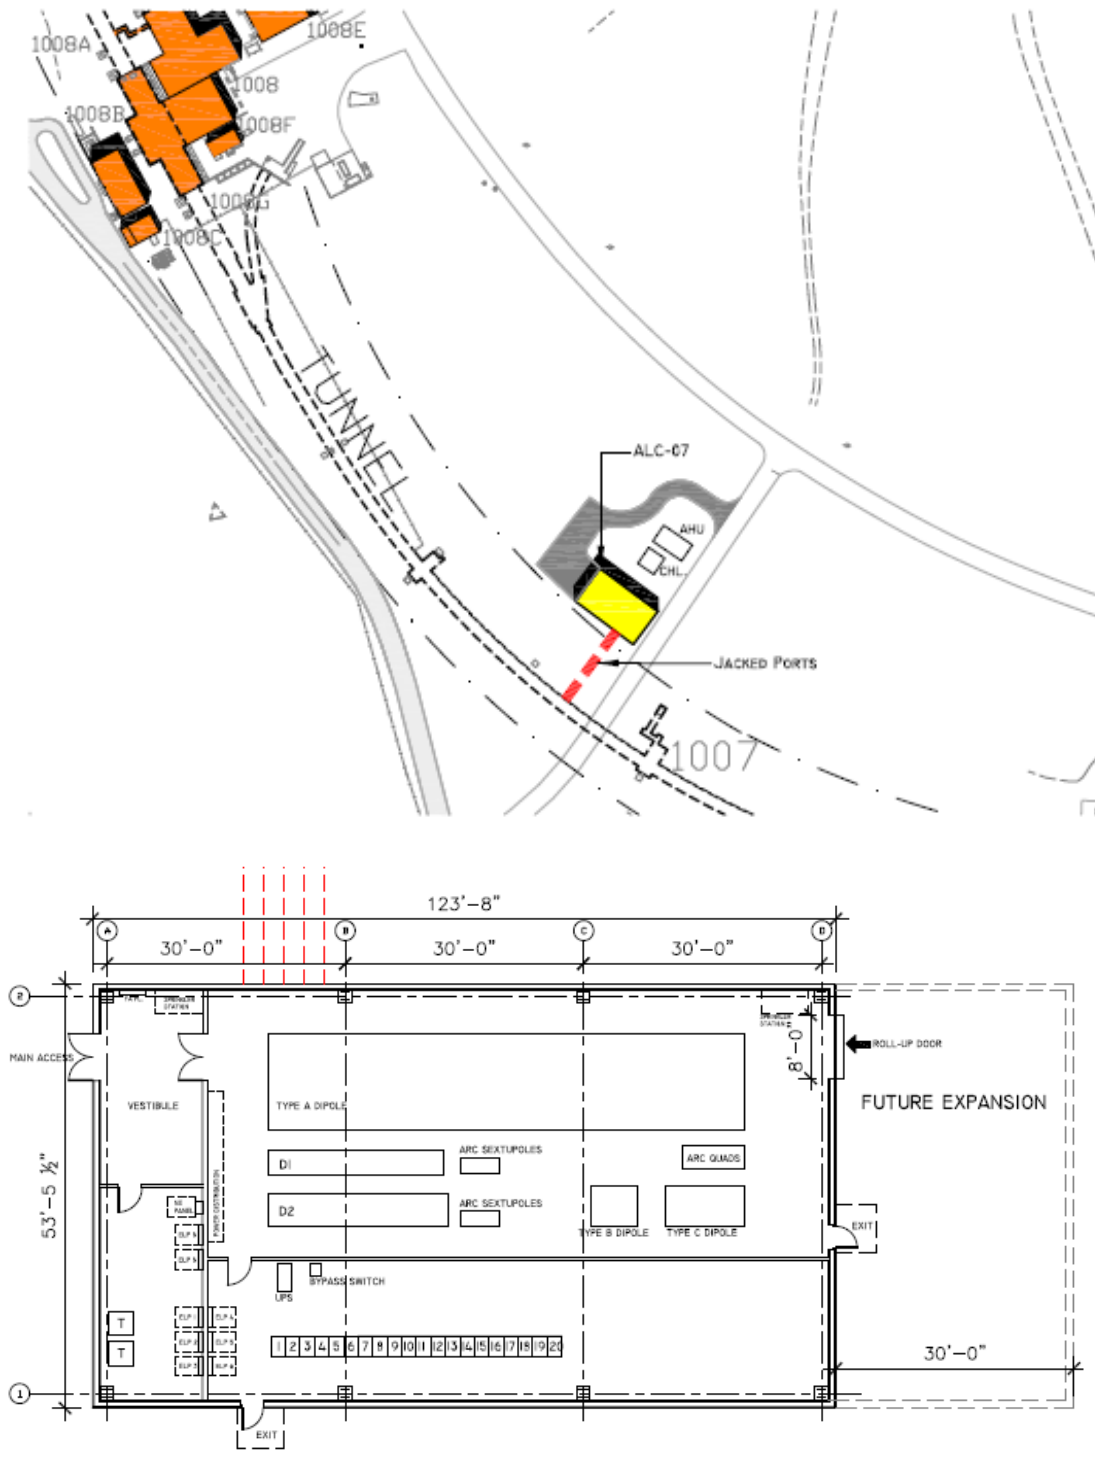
Alcove layout Number 1. Top: site plan. Bottom: floor plan.
